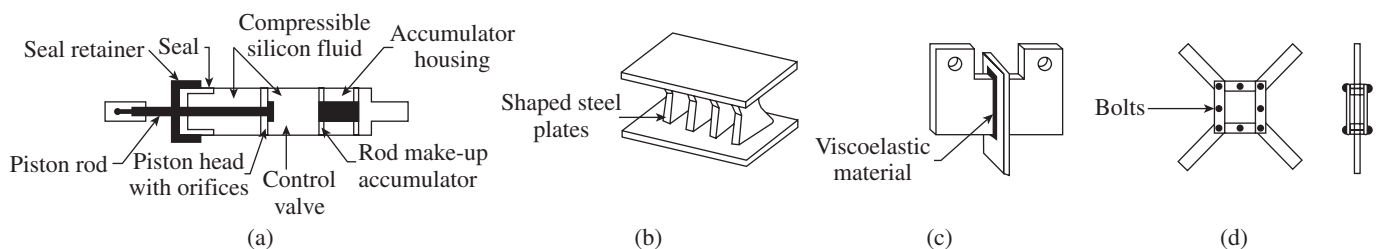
Types of dampers (a) Typical viscous damper (b) Typical hysteretic damper (c) Typical visco-elastic damper (d) Typical friction damper
